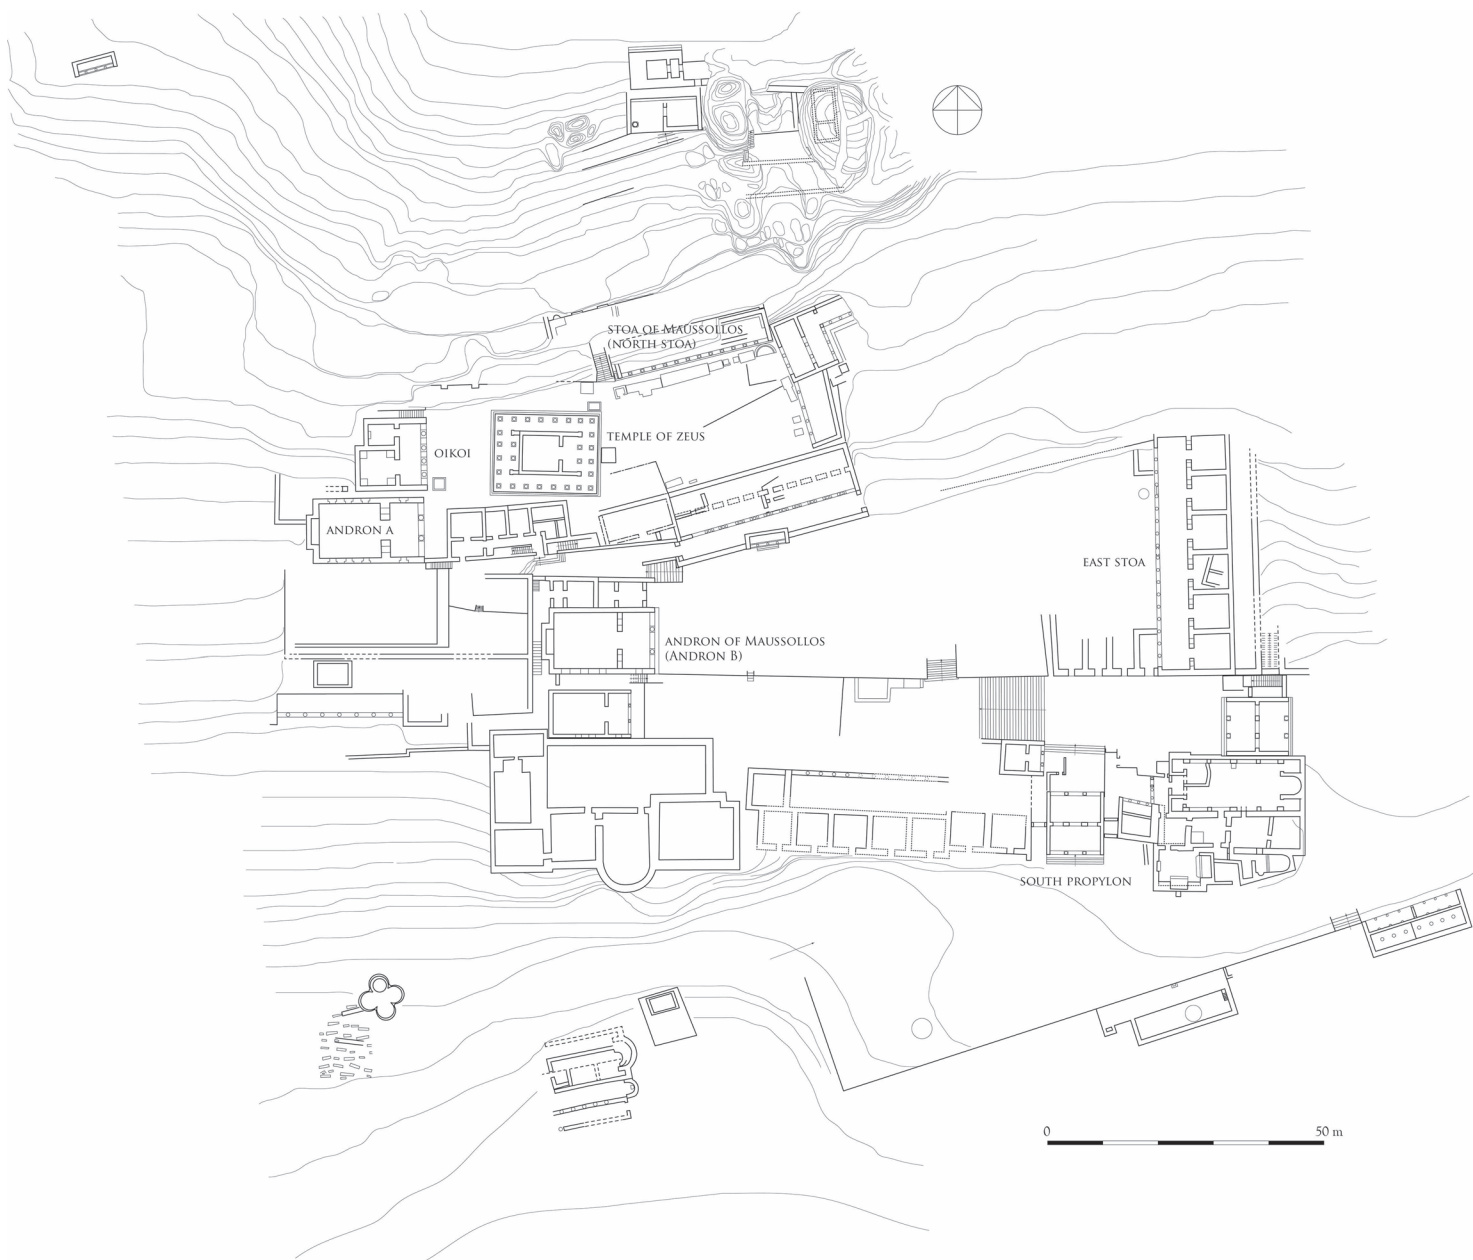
Plan of Labraunda (O. Henry, 2023).
